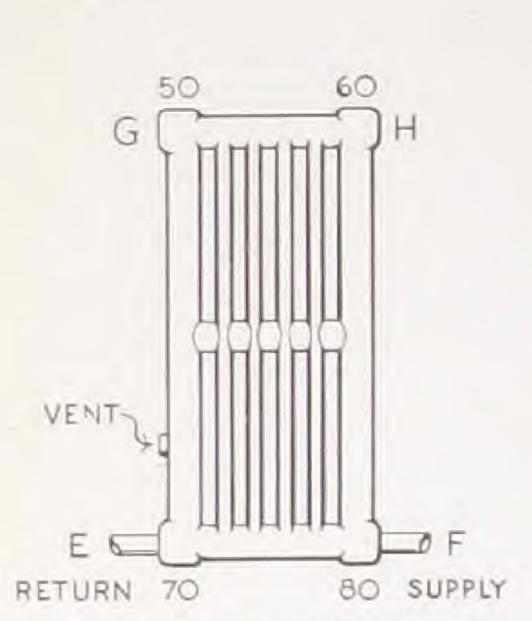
One and Two-Pipe Steam - Regular Vertical Assembly
